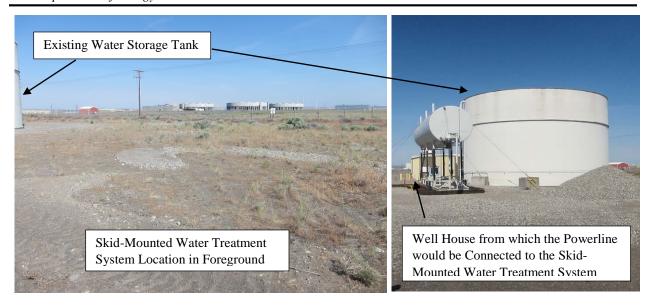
Proposed Skid-Mounted Water Treatment System Location
